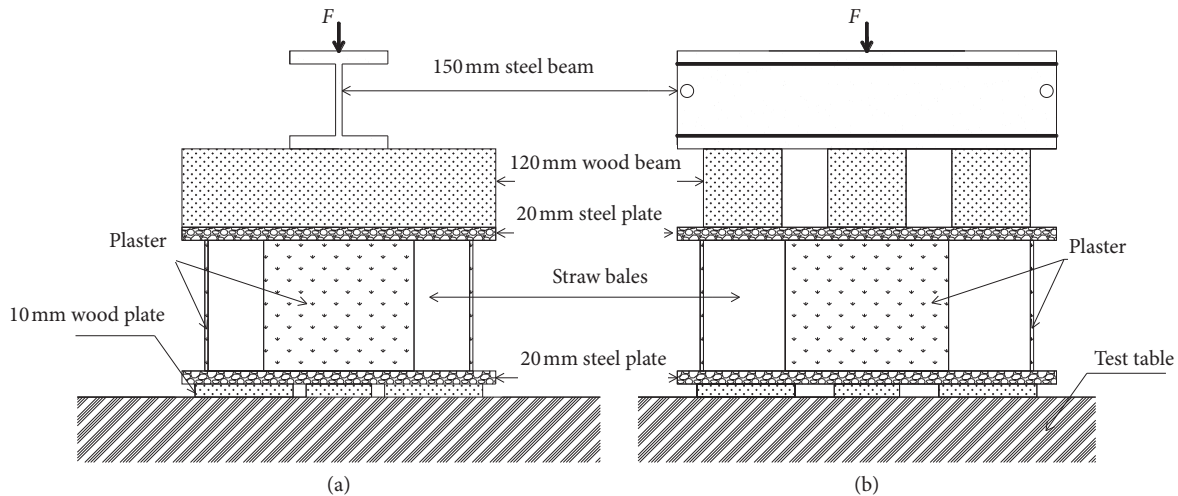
The experimental setup of plastered straw bales. (a) Front elevation. (b) Side elevation.
